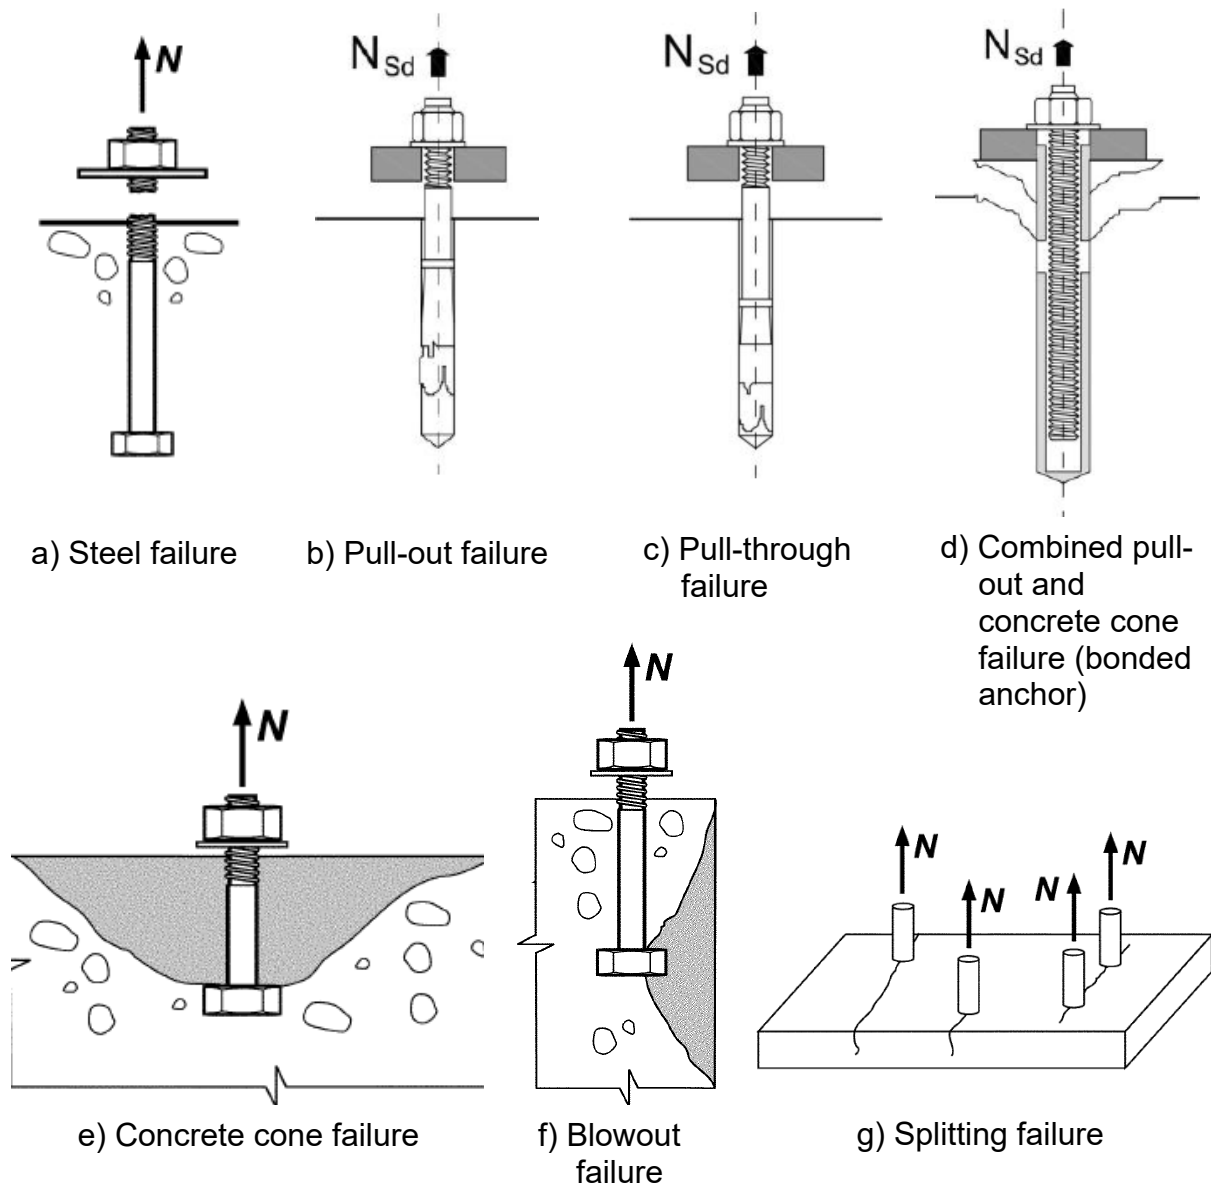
Failure modes of anchors under tension load (from [58] and [72]).
